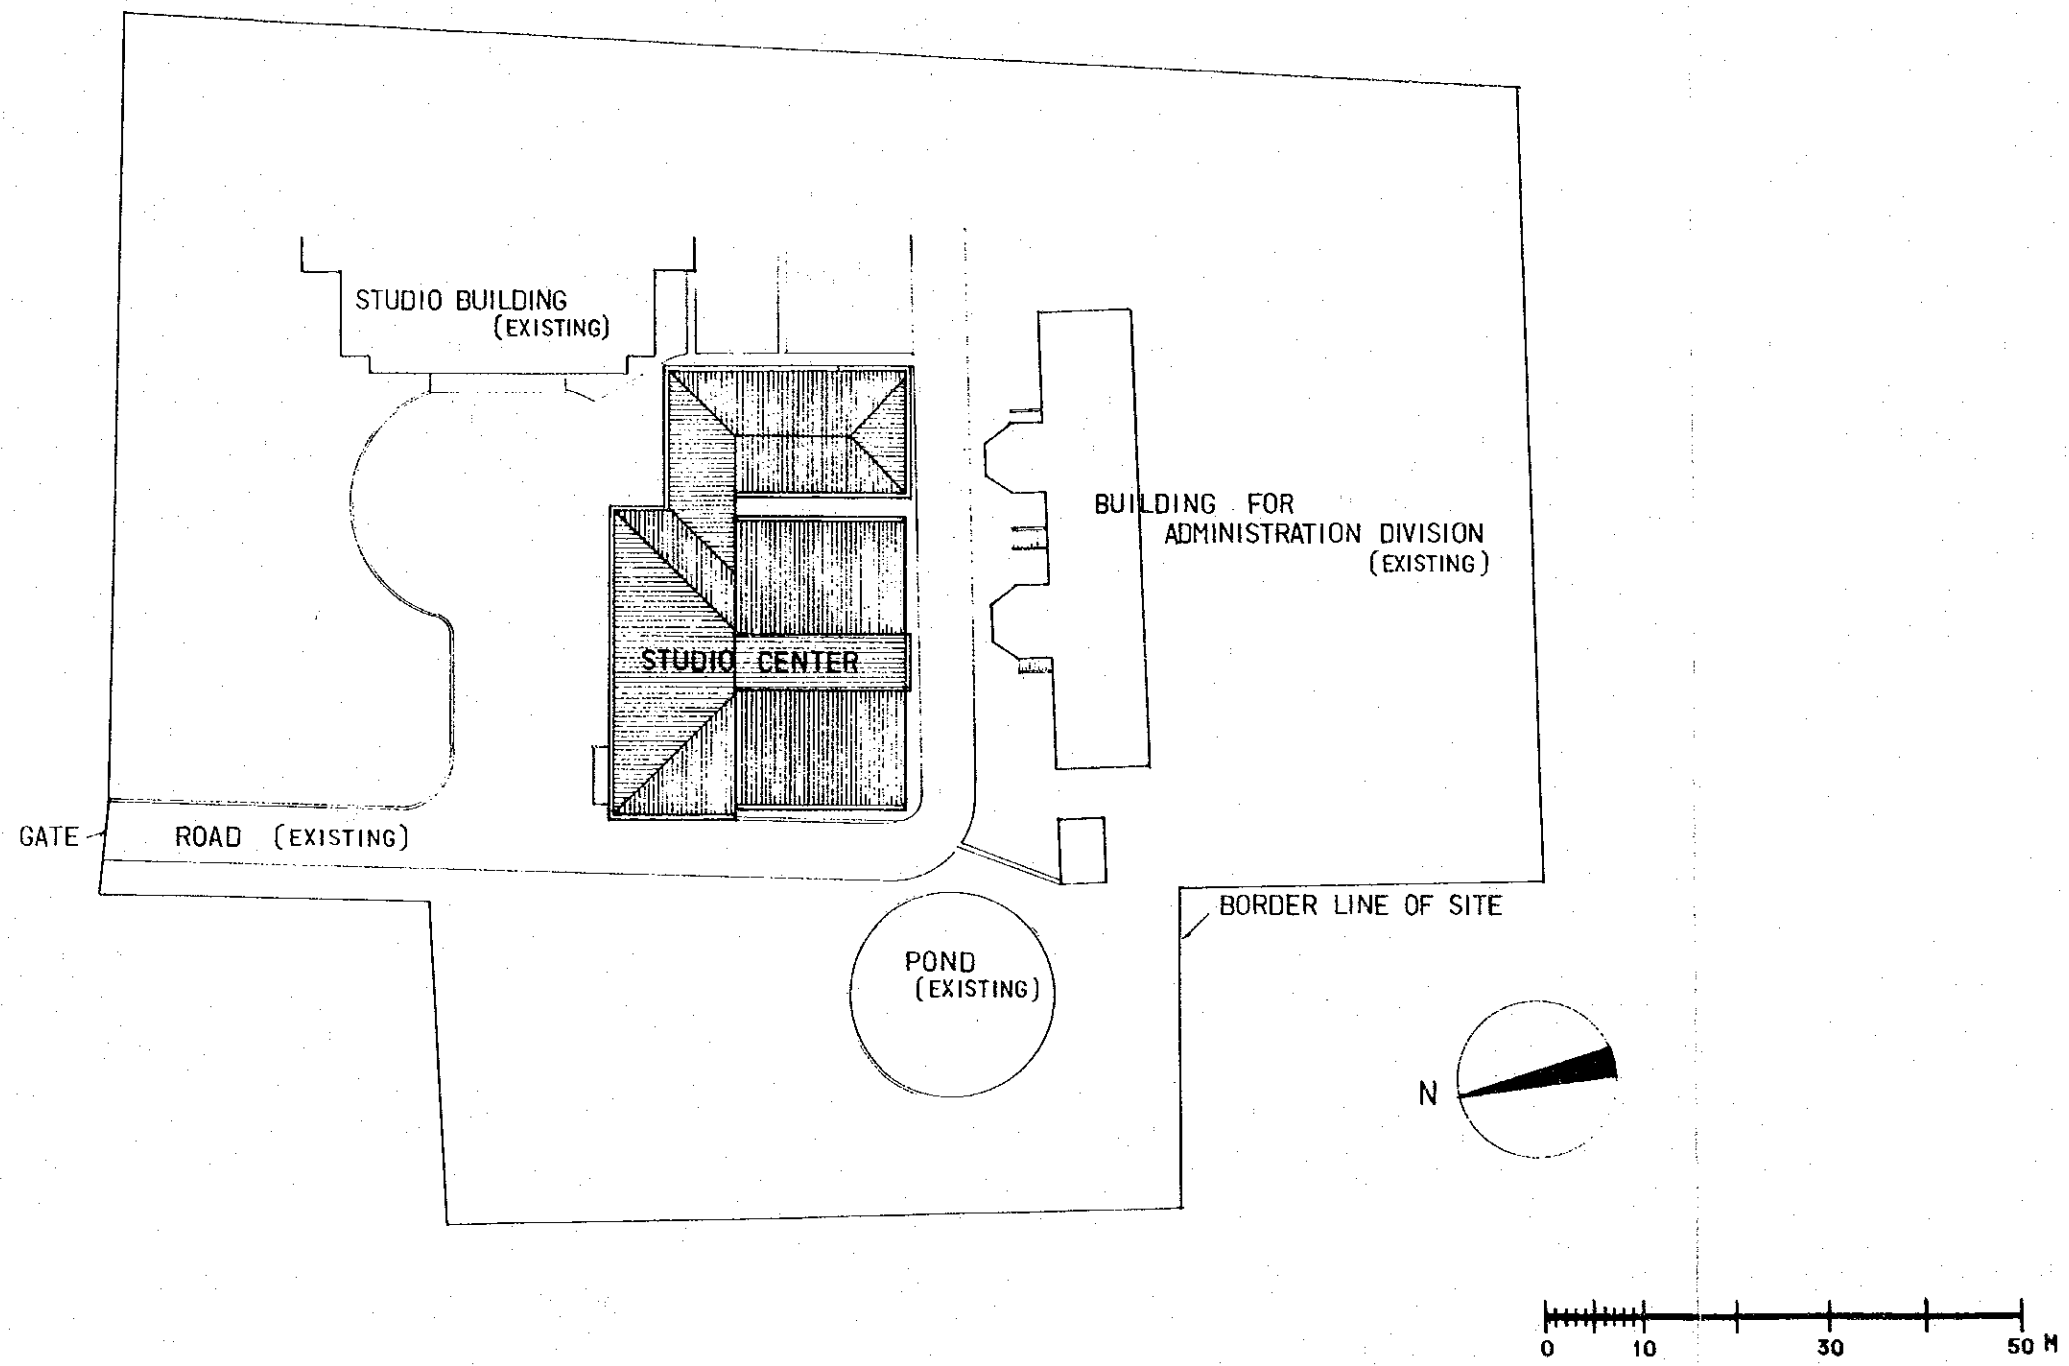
SITE PLAN — KATHMANDU STUDIO CENTER
